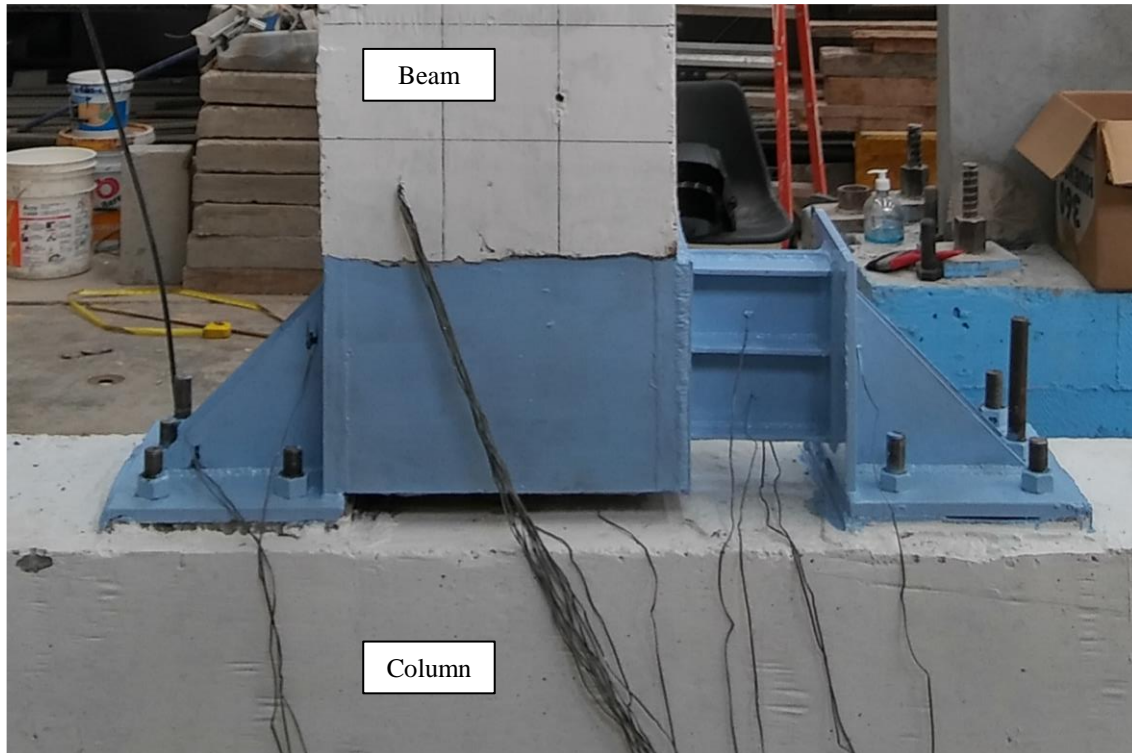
Connection of the beam and I-damper to the column of specimen P-ID-1.
